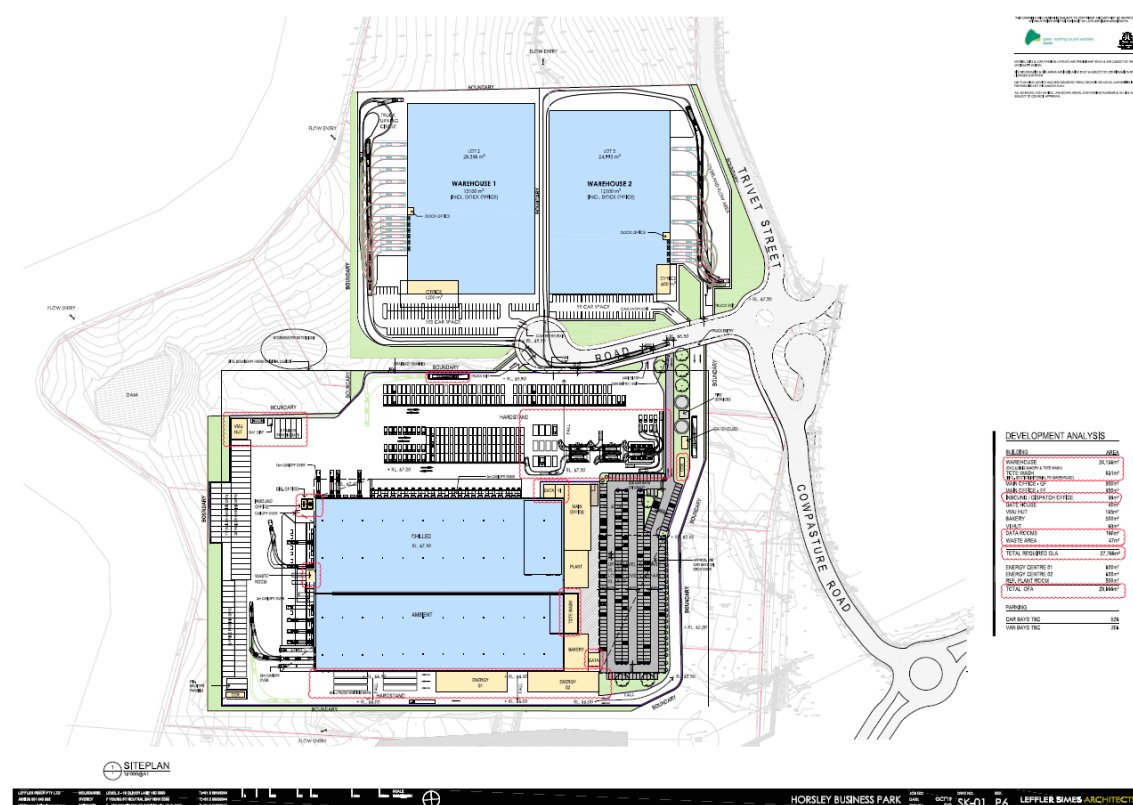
SSD7664 Mod1 Masterplan Layout
